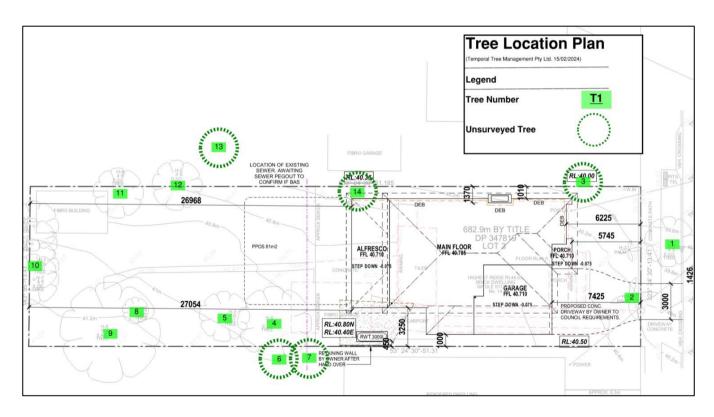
Proposed Site Plan* as prepared by *Masterton*, Job No: 2018920, Sheet No. 01.00, Rev. 1, drawn 19.10.2023.
